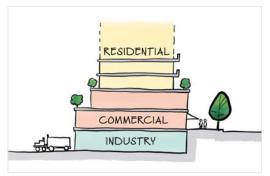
Design new buildings with integrated loading and servicing (10.1.6 b).
